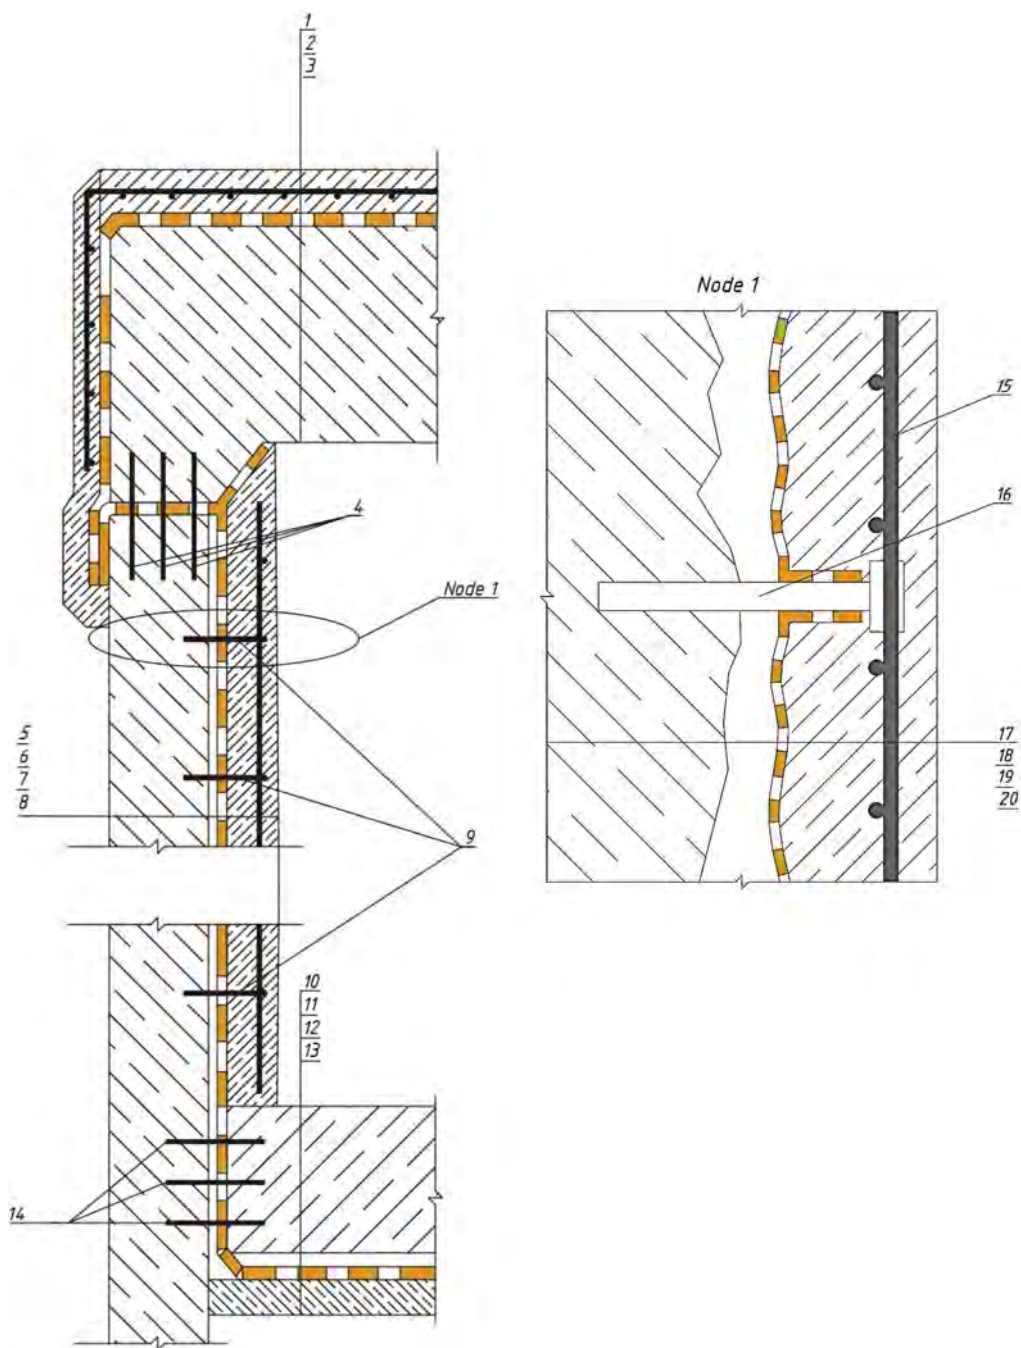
Waterproofing the load-bearing wall of an underground 'diaphragm wall' structure with sprayed polymer compound with two-sided adhesion: 1 – protective layer of concrete on mesh; 2, 7, 12 – sprayed waterproofing coating with primary and secondary adhesion; 3 – reinforced concrete floor; 4 – free length of 'diaphragm wall' reinforcement; 5 – load-bearing 'diaphragm wall'; 6 – levelling layer (if necessary); 8 – pressed wall of concrete on mesh; 9 – anchoring the pressure wall; 10 – buckle plate; 11 – protective sand cement screed; 13 – concrete bedding; 14 – anchoring the buckle plate; 15 – steel mesh; 16 – steel anchor; 17 – load bearing 'diaphragm wall'; 18 – levelling/smoothing layer (if necessary); 19 – sprayed waterproofing coating with primary and secondary adhesion; 20 – pressed wall on mesh.
